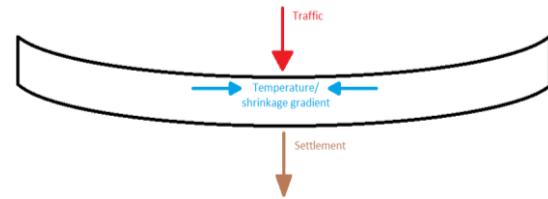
Schematic drawing of the forces across the width of a concrete pavement
